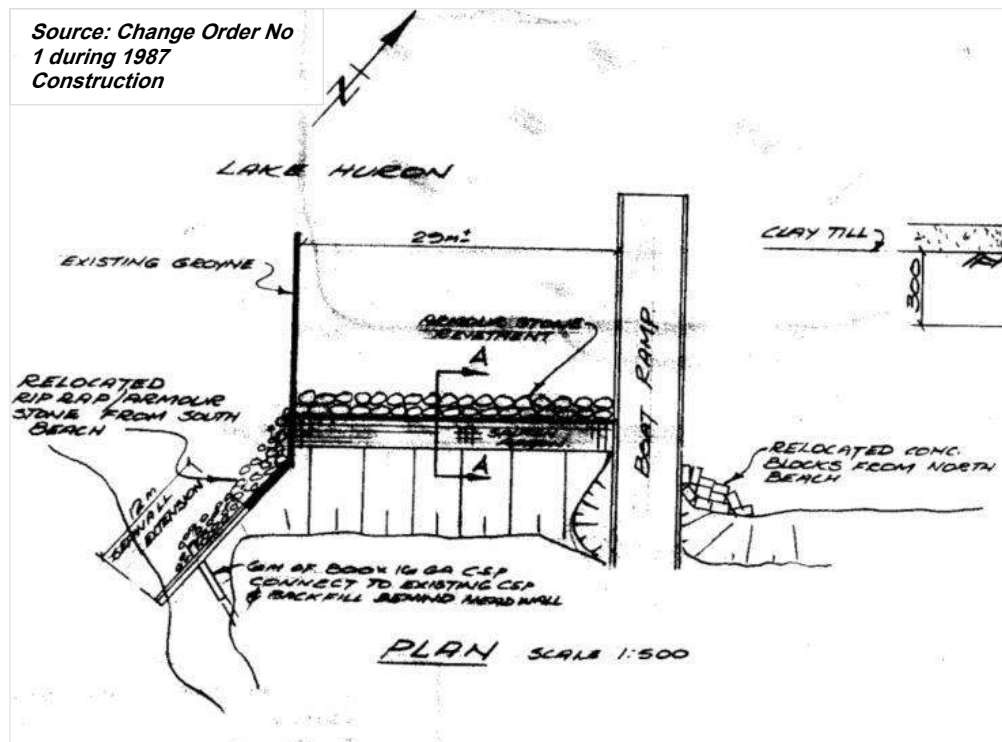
Original Proposed Plan of South Seawall Extension (#3)
